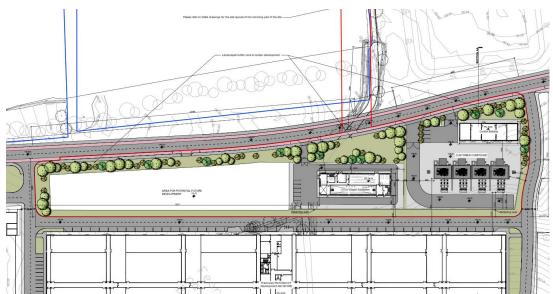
Extract of the Site Layout of the proposed substation element of the development prepared by Reddy Architecture + Urbanism.
